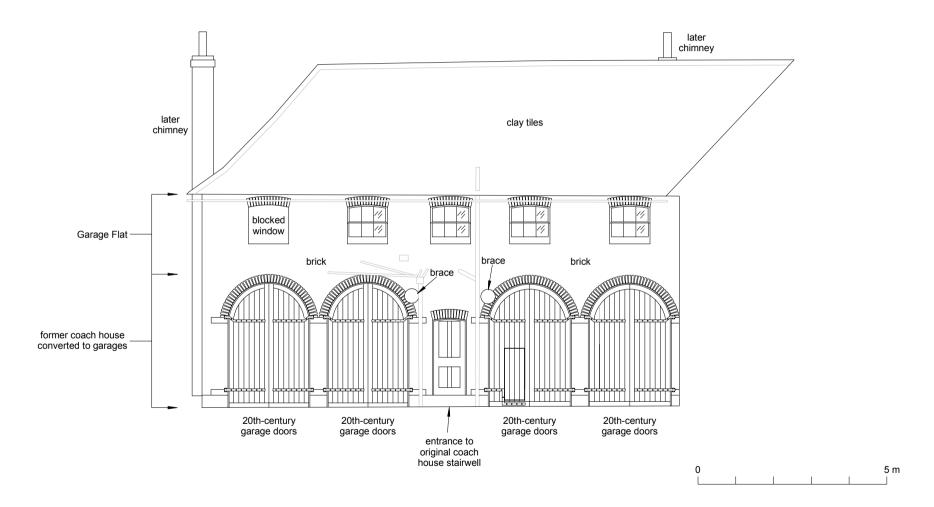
Structure 1/2, 18th-century stable block north-east elevation.
